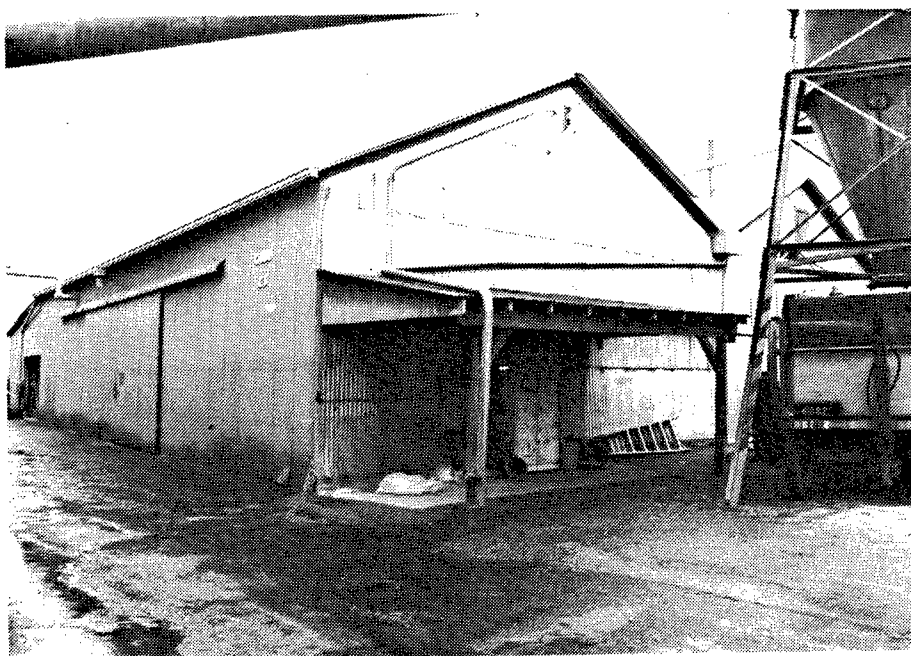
Building 505: Lumber and Pipe Shed with aluminum siding.
